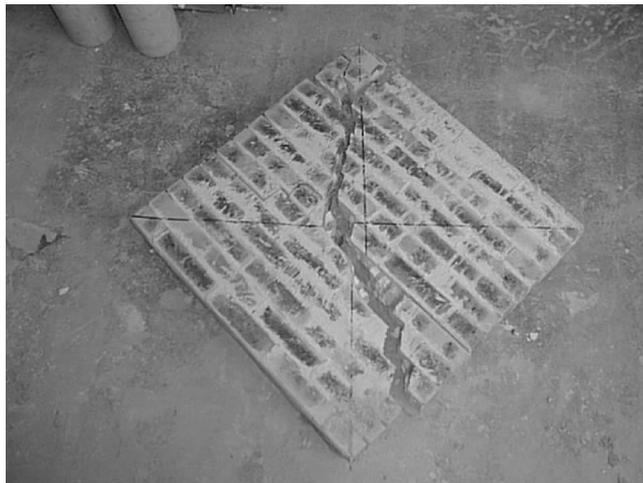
Failure pattern of unreinforced masonry panels
